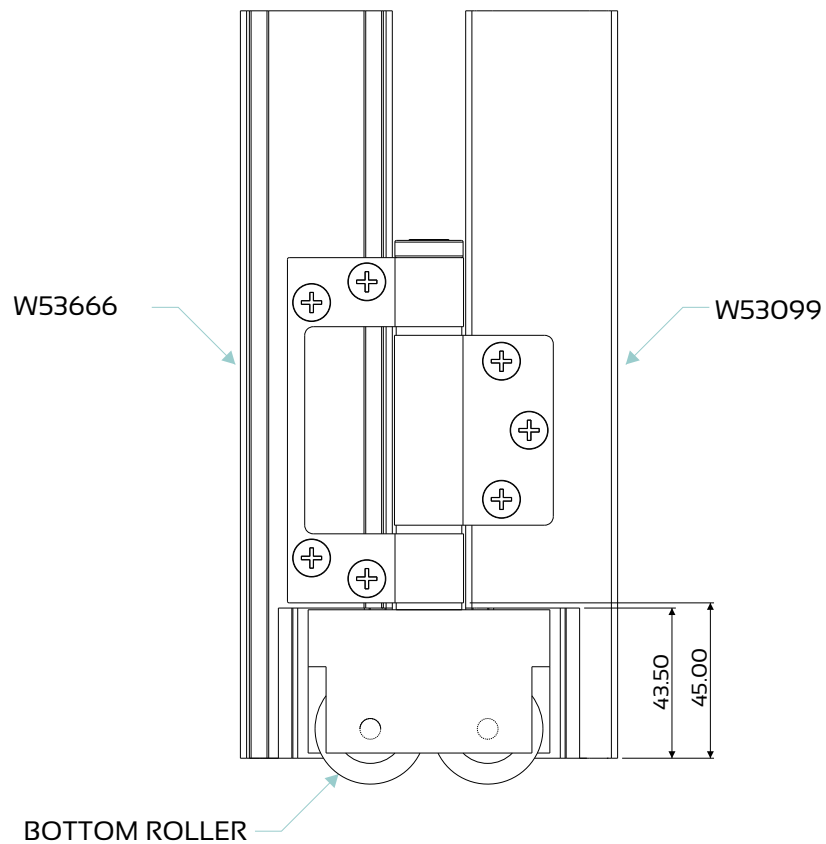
DETAIL TYPICAL TO HEAD AND SILL OF DOOR
